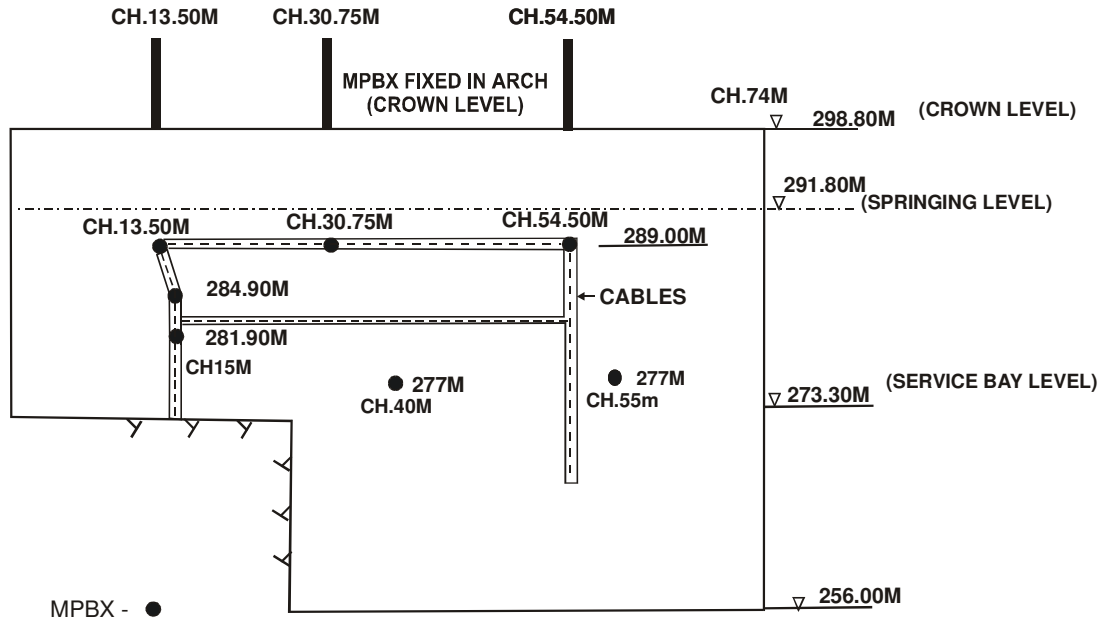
L-section of Machine hall showing upstream wall with Instrument locations and Cable layout.
